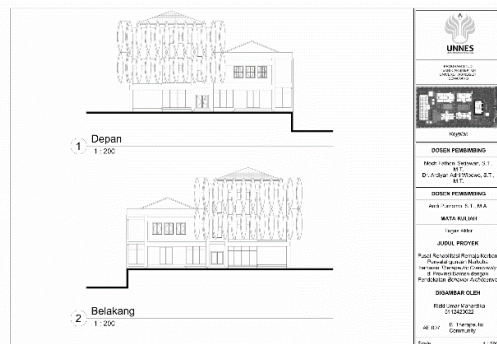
Therapeutic Community (TC) Building Front and Back Elevation
